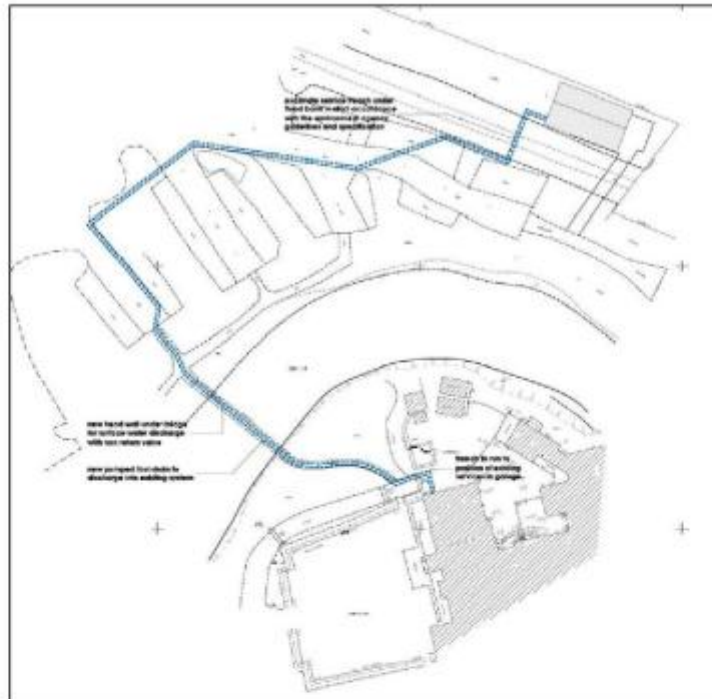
Location map of proposed Gardeners Store and service trench, showing separation from house and main gardens
